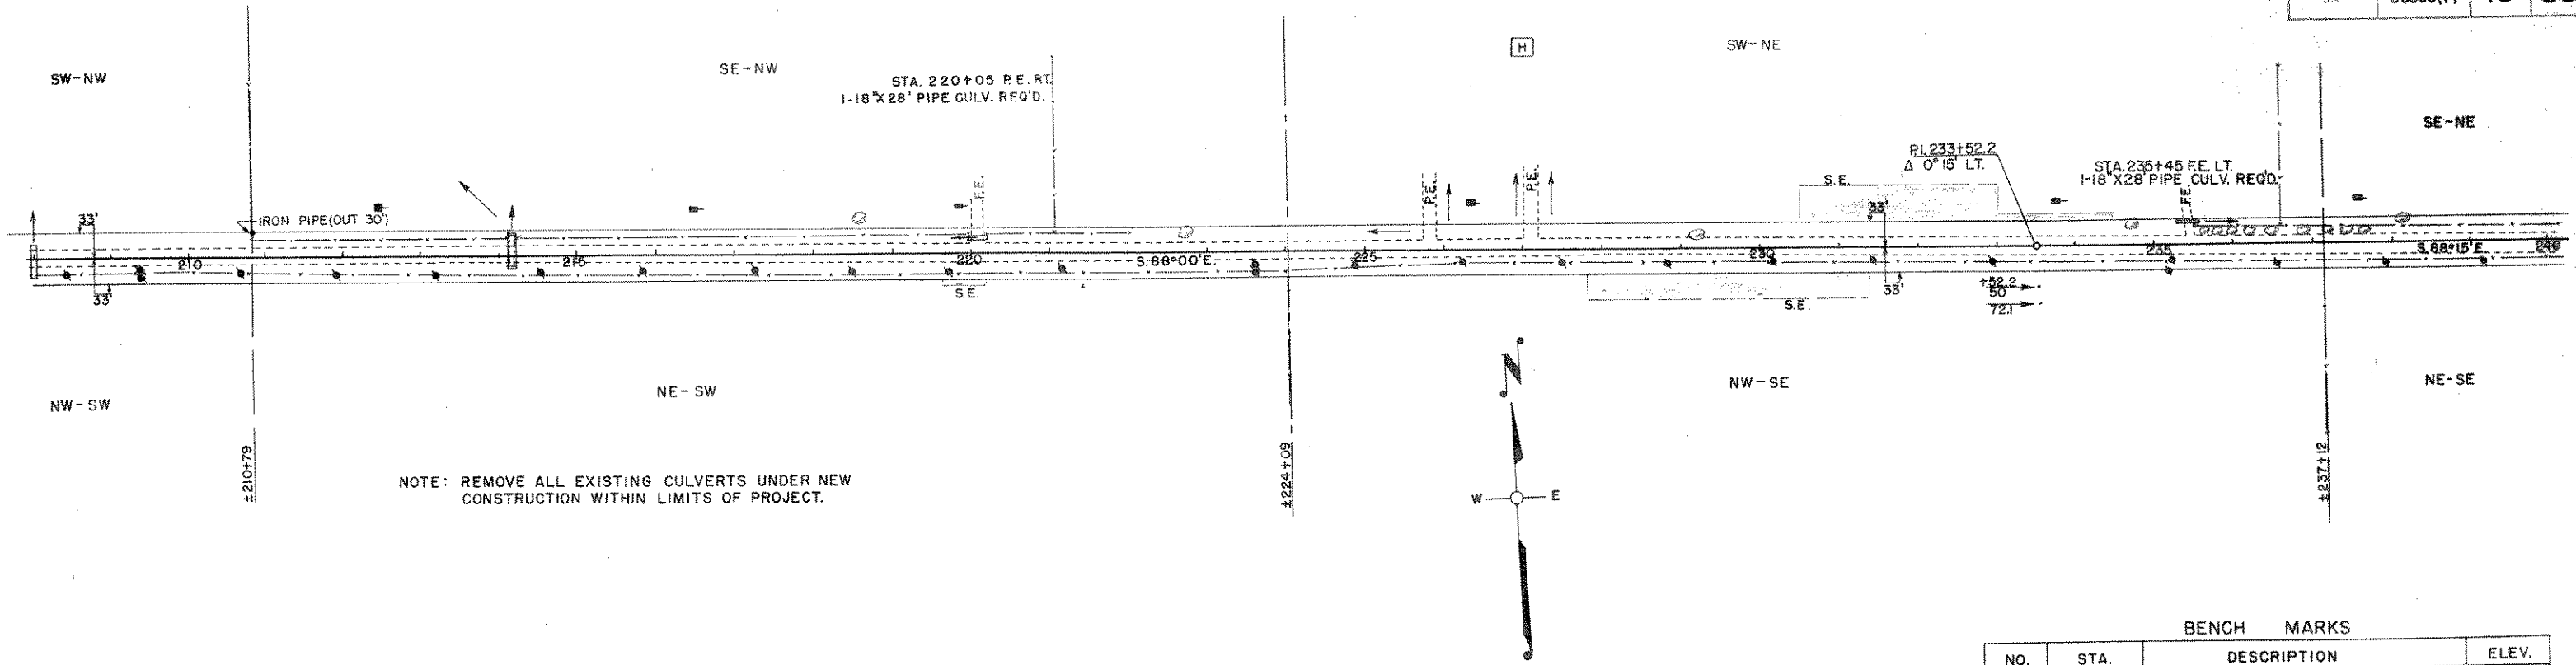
PLAN PROFILE OF ROAD STANDARD
